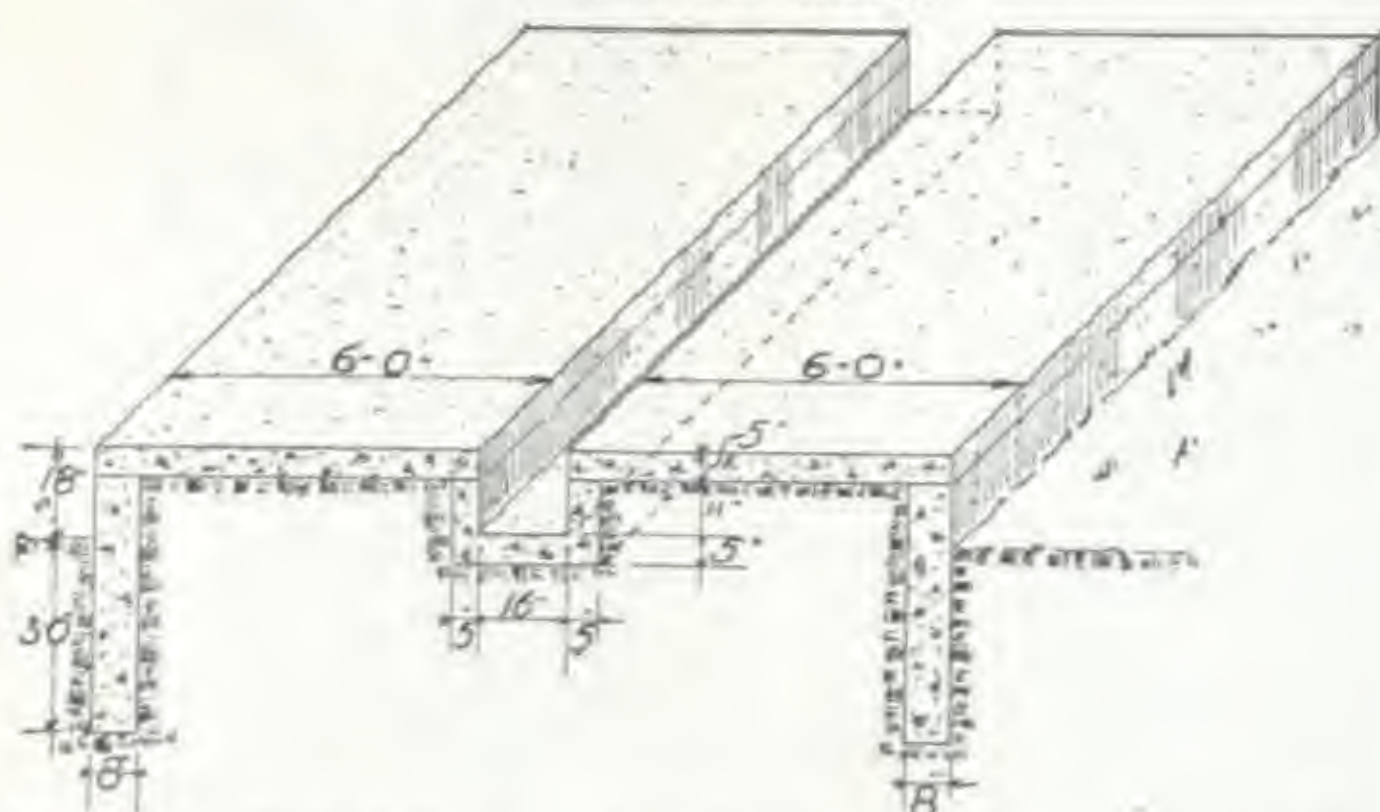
Detail for construction of concrete foundation and floor for corn crib.
